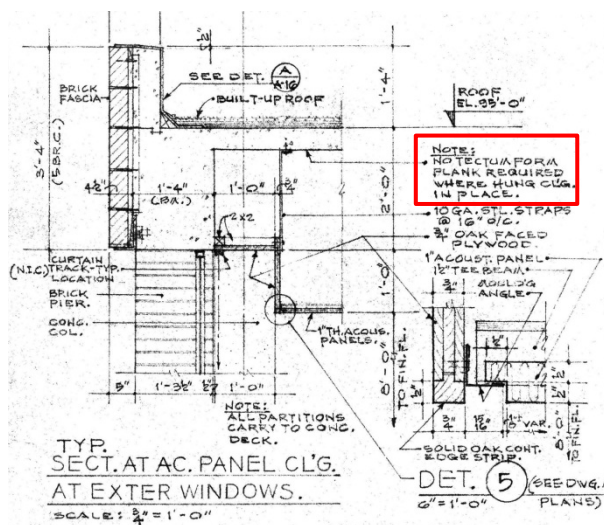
Original detail drawing with note (in red box) indicating "no Tectum form plank required where hung clg. [ceiling] in place." [From 1968 Drawing A-25.]
